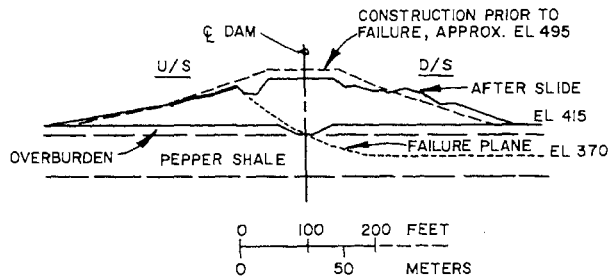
WACO DAM, TEXAS--EMBANKMENT AFTER FAILURE
